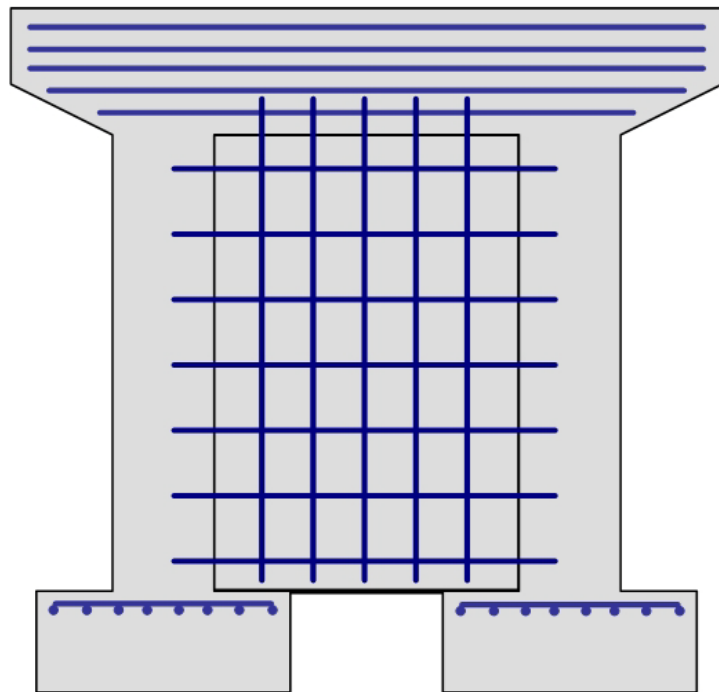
Secondary Reinforcement in Column Bent with Web Wall
